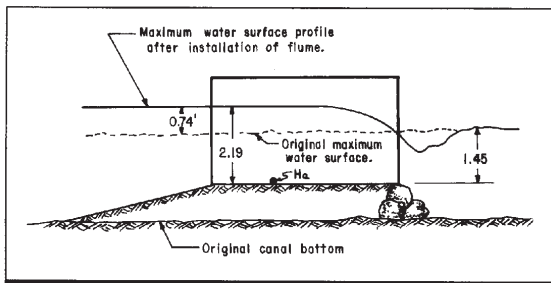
Analysis of upstream and downstream water elevations and crest elevation above the channel bottom.
